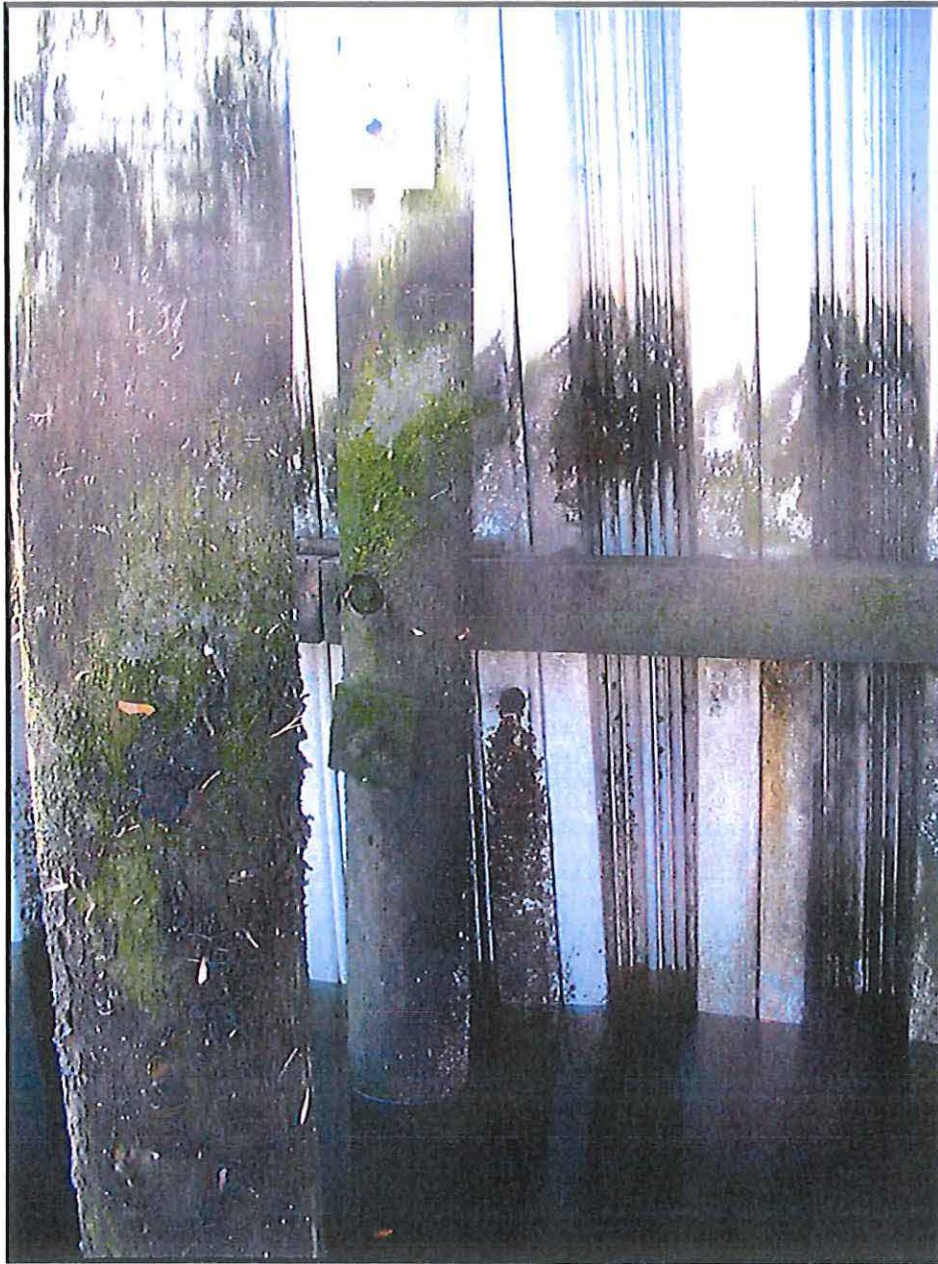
Note lower level of tie-rods; this detail was not provided on the Contract Drawings. Note skew or slope in the sheet piling.
